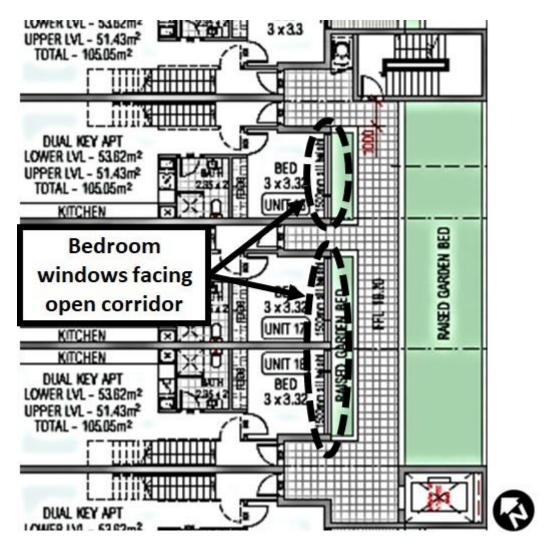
Typical layout of levels 2, 3 and 5 with windows facing gallery spaces.
